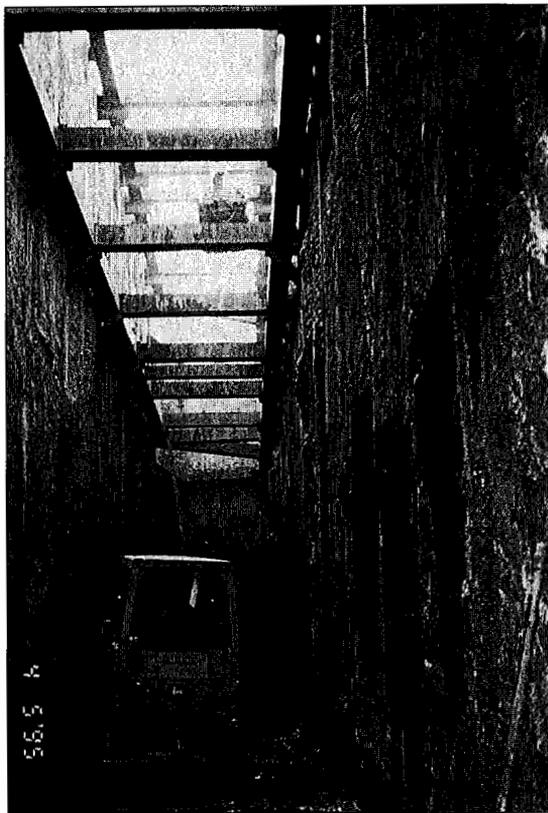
A view of the excavation within the completed SPTC wall jet grout kicker slab.
